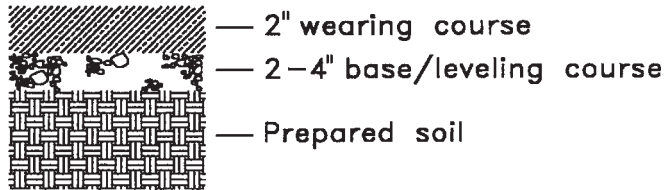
Detail of typical asphalt pavement for pathway, light duty.
